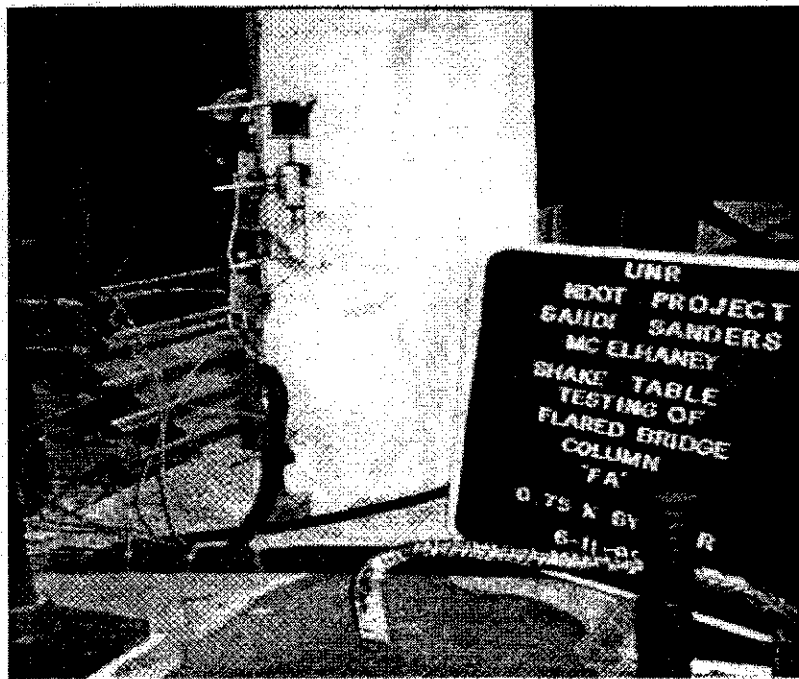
Specimen FA, Run 3, Spalling
